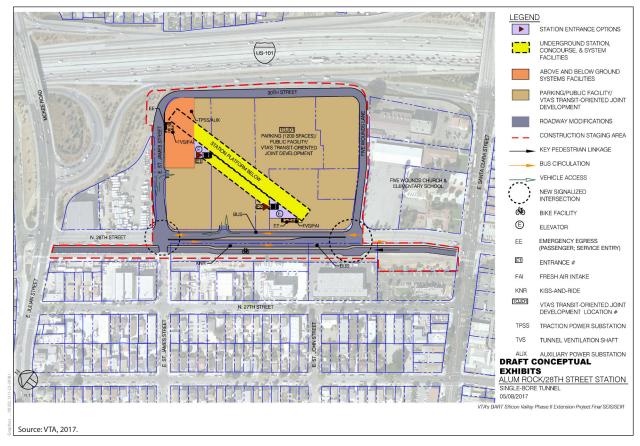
Alum Rock/28th Street Station Plan from SEIR
